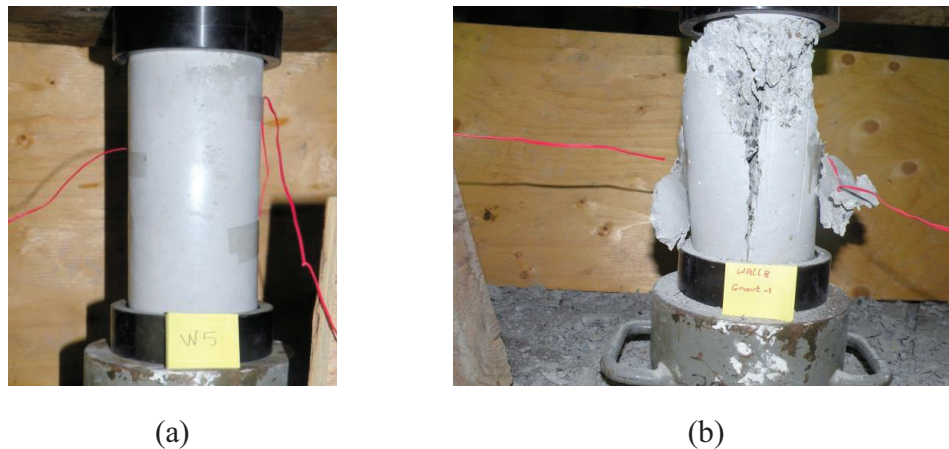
Compressive strength test for grout: (a) prior to failure; (b) after failure
